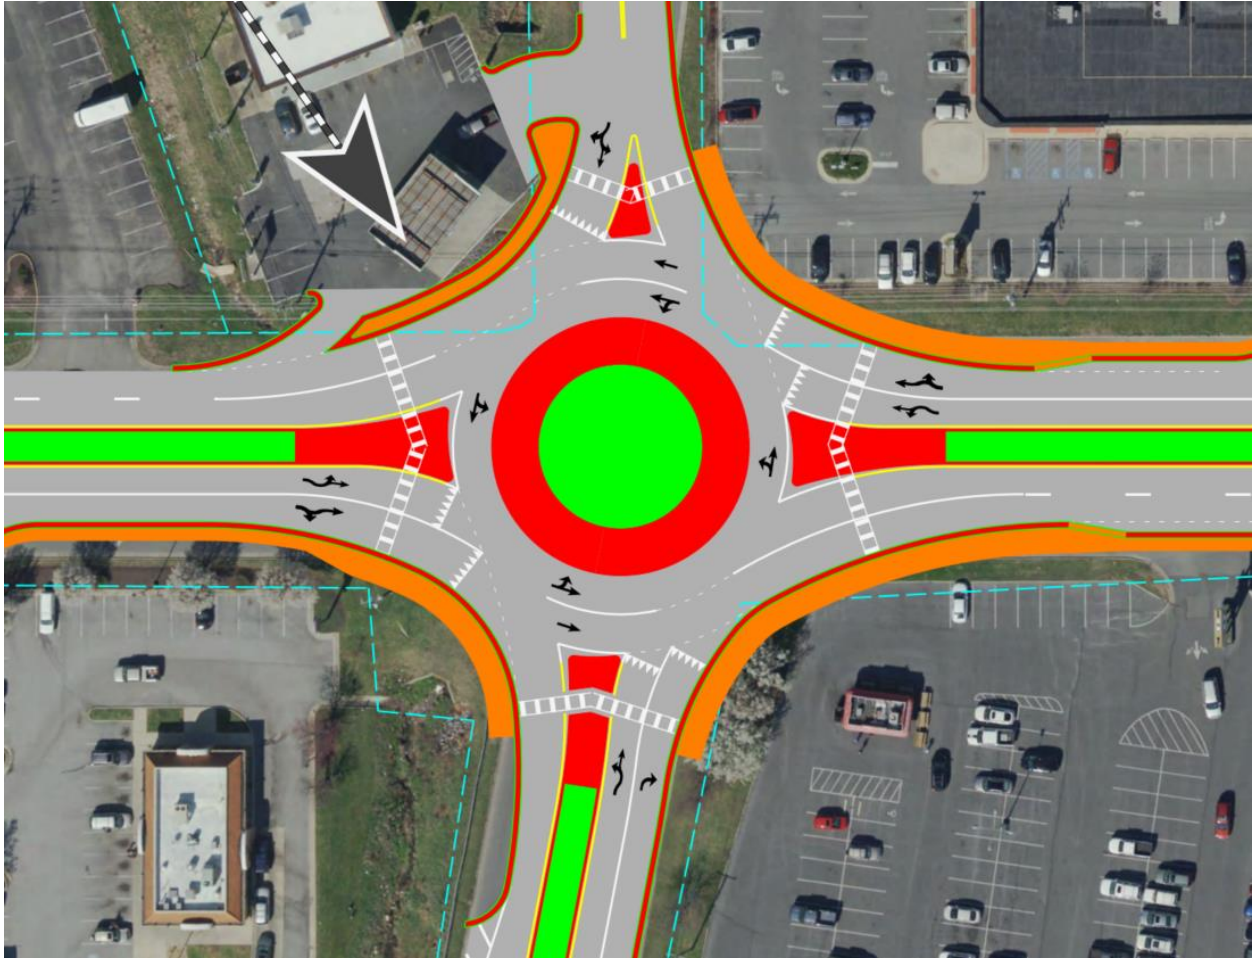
US 250 and Low Dewitt Boulevard/Pelham Drive Proposed Roundabout Layout
